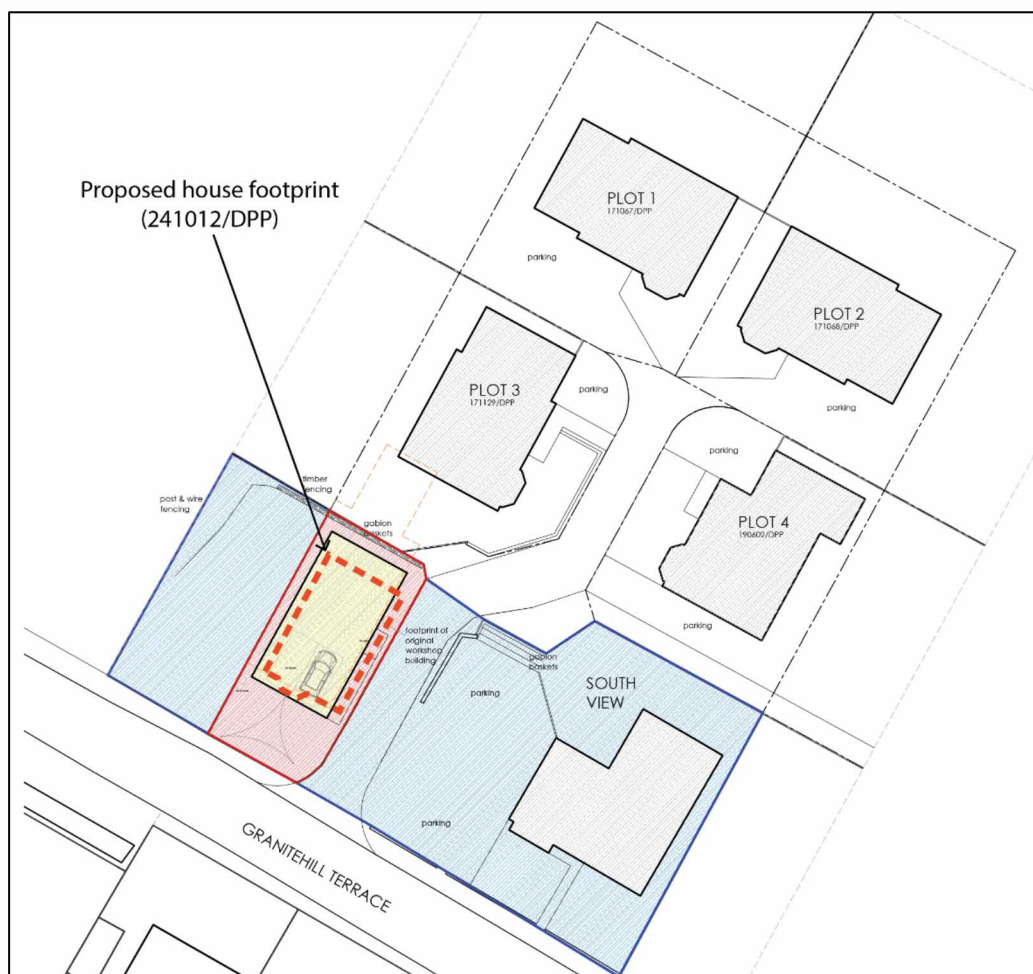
Site Plan from application 230337/DPP, with mark-up showing the indicative reduced scale of the proposed house footprint in comparison to the previously refused garage footprint (red dashed outline) (Source: ACC Application Website)
